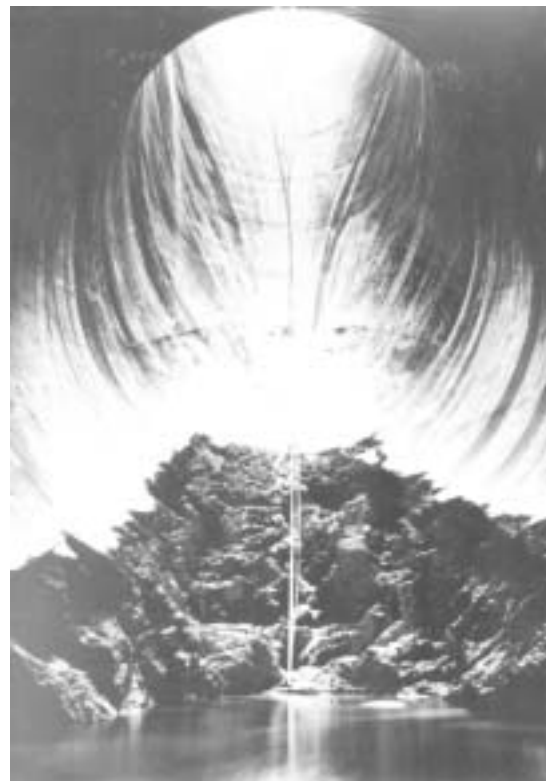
Eroded area in spillway tunnel at Hoover Dam, 500 ft (152 m) below crest, before repair with PA concrete.
